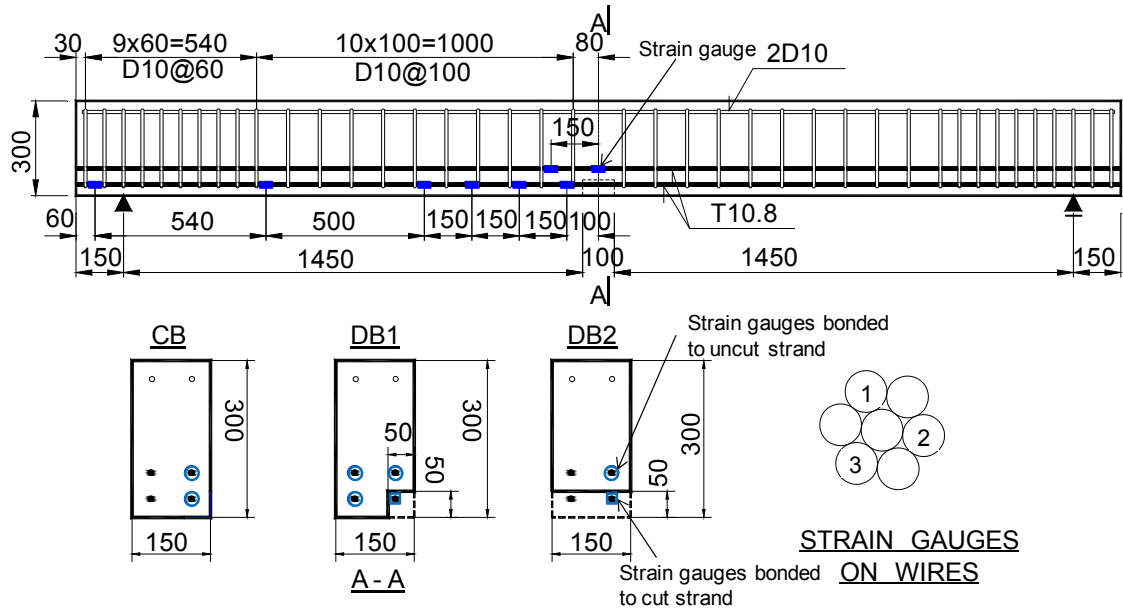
Arrangement of reinforcing bars and internal strain gauges (Unit: mm)
